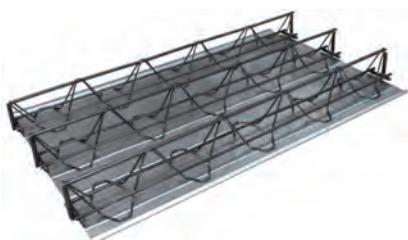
Tower floor composite decks – trussed deck (Source: Thornton Tomasetti)
